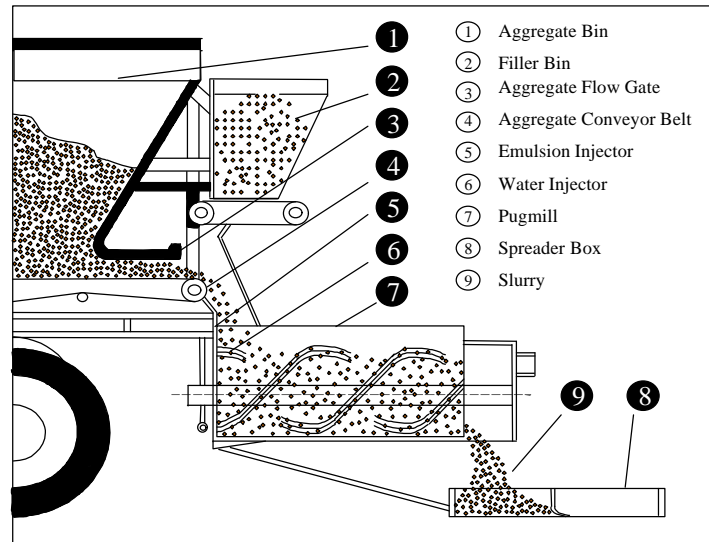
Schematic drawing of typical slurry seal mixer/spreader.⁽⁷⁾
